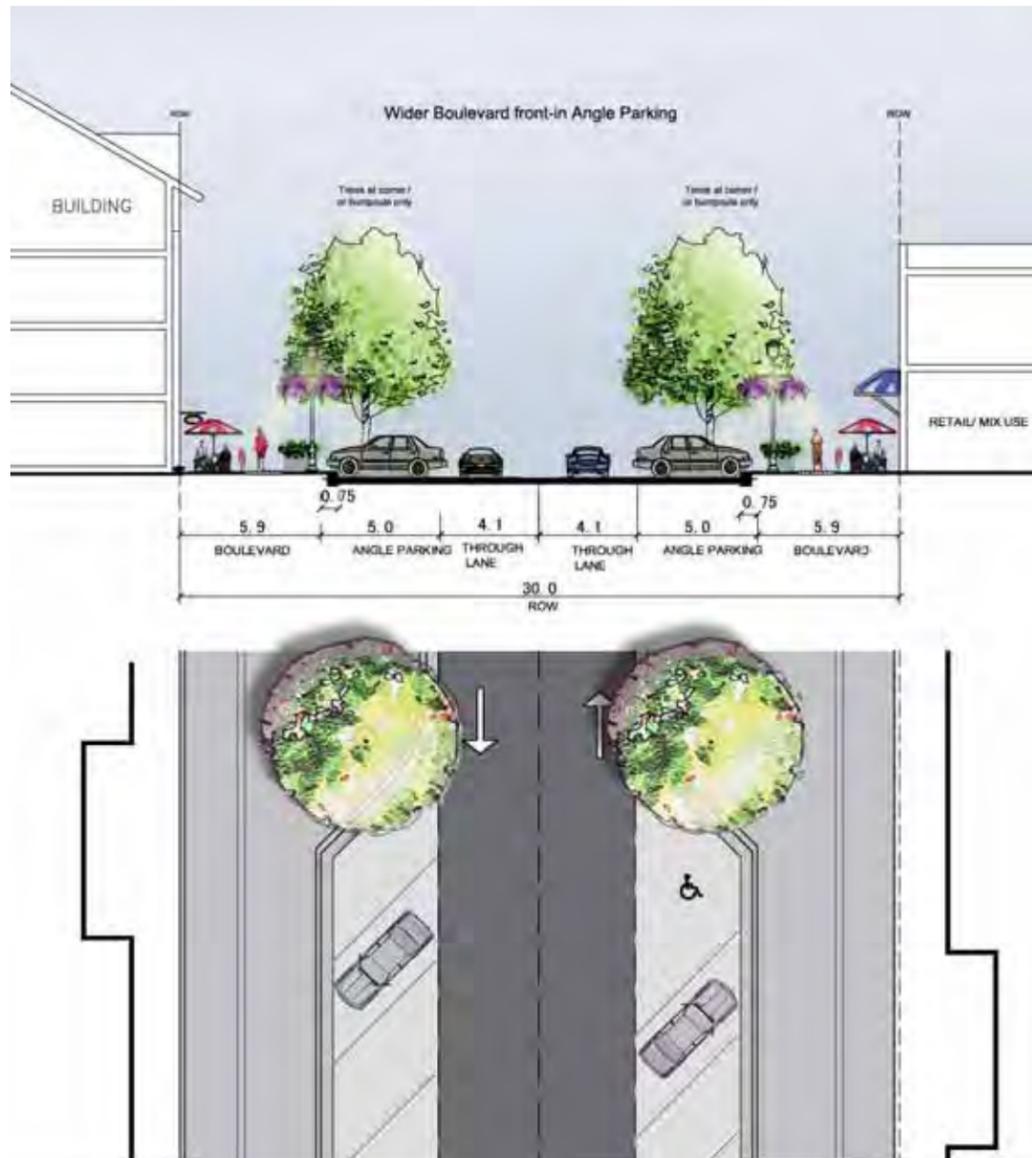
Option 1 - Angled Parking: Typical Cross Section and Plan
